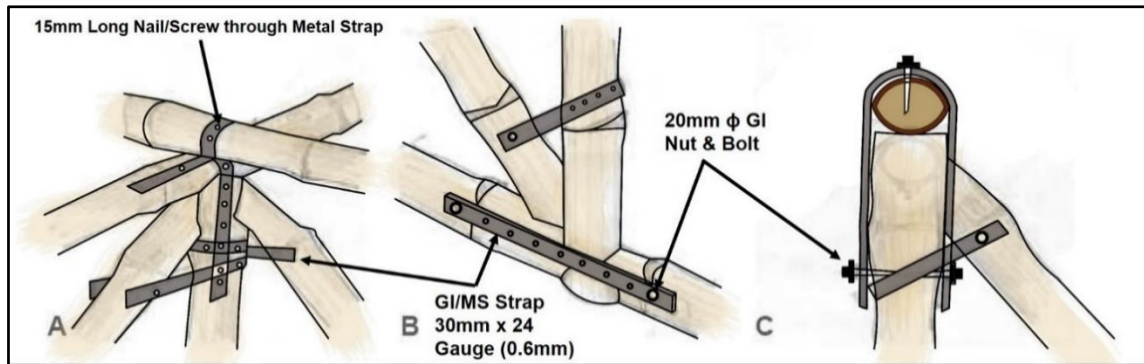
(B) CONNECTION DETAILS OF BAMBOO/BALLI WALL
